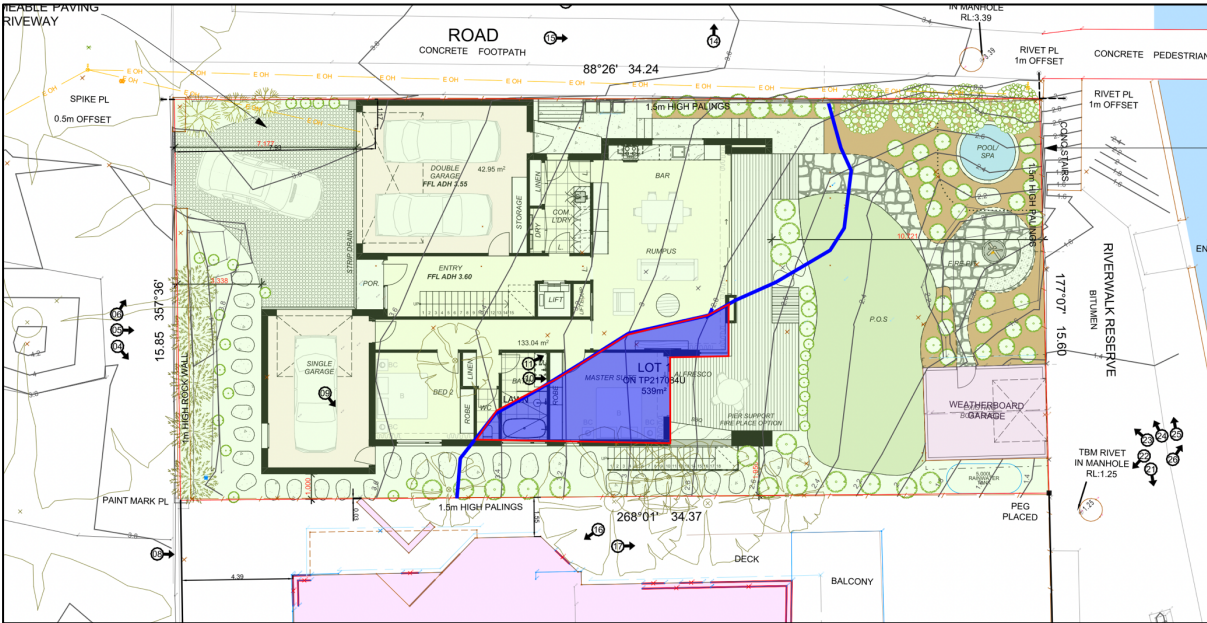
Extent of internal floor area of building within Floodway Overlay (approximate)
